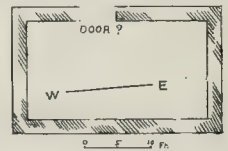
Foundations of walls of early Oratory, near Llanllechid by Bangor, North Wales. (The shading indicates where stones are in situ.)
